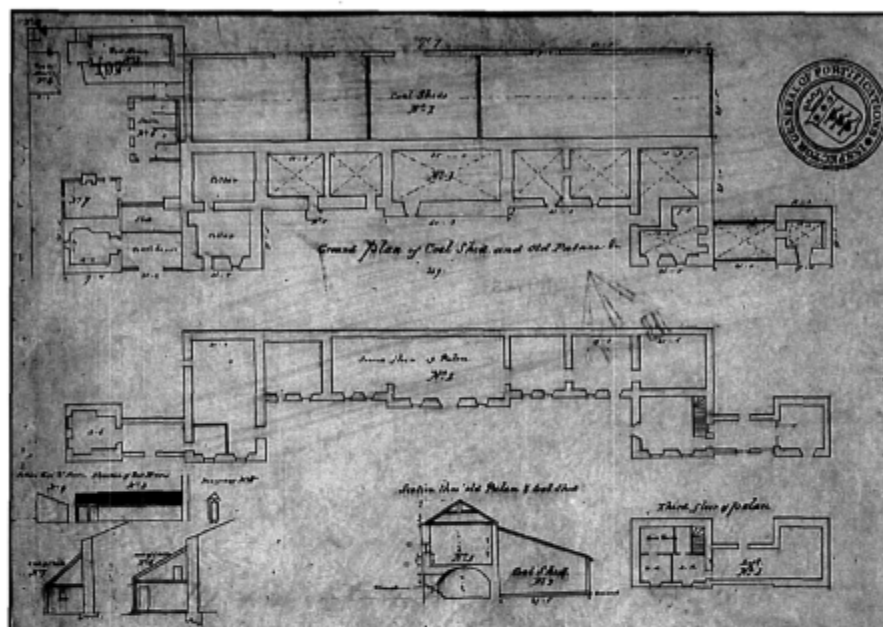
Ground plans, sections and elevations of coal shed, old palace and old boat house or straw house. E.W. Durnford. Quebec, 24 sept 1823. ANC NMC4933 H3/350/Quebec/1823
